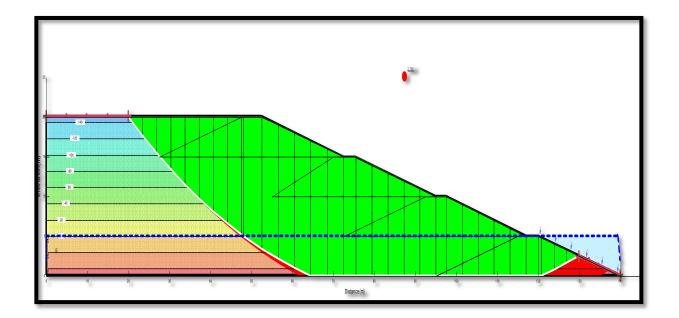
Embankment cross section for 1:4 slope at 5 m water level
